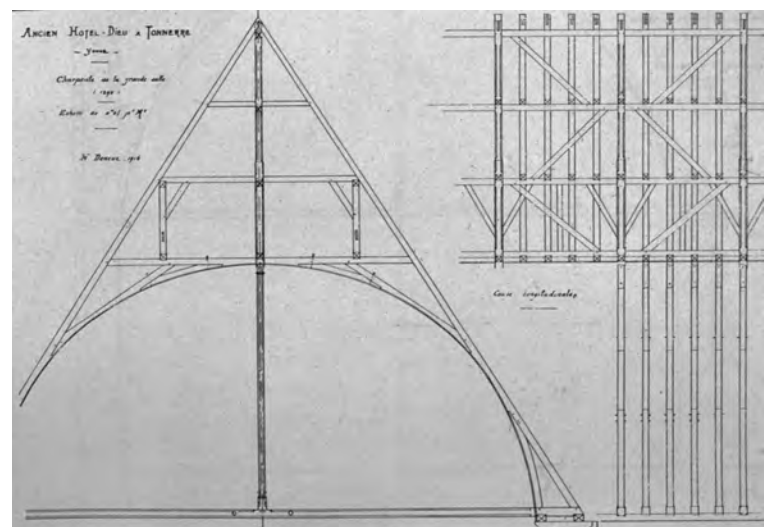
Transverse and longitudinal sections (the latter from the interior) of the roof of the Maison Dieu at Tonnerre illustrating the tie beam truss with two upper collars and axial members framed into the hung kingpost. The rafters of uniform scantling are braced to form the profile of the semi-circular arch to which the timber panels are nailed. Section (D. 6990, 1916), by H. Deneux, CRMH, Paris.
